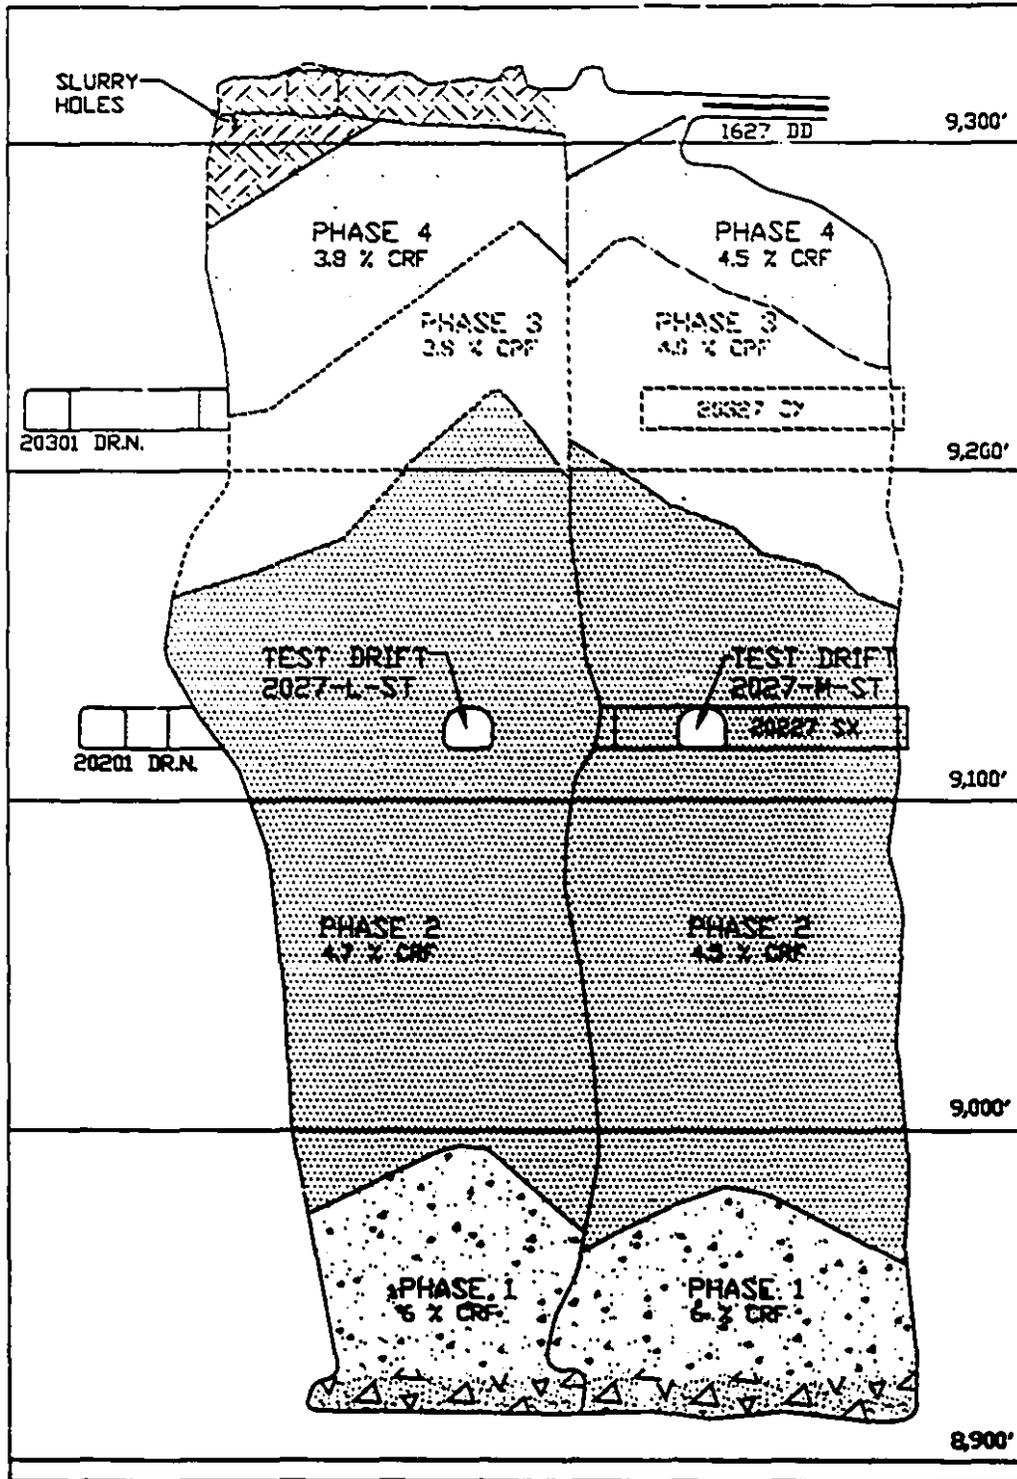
2027-M-ST LOOKING NORTH
